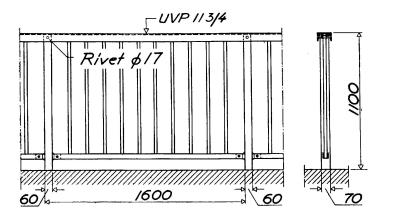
Footpath parapet on the new Liljeholmen bridge in Stockolm. Weight 80 kg/m.
